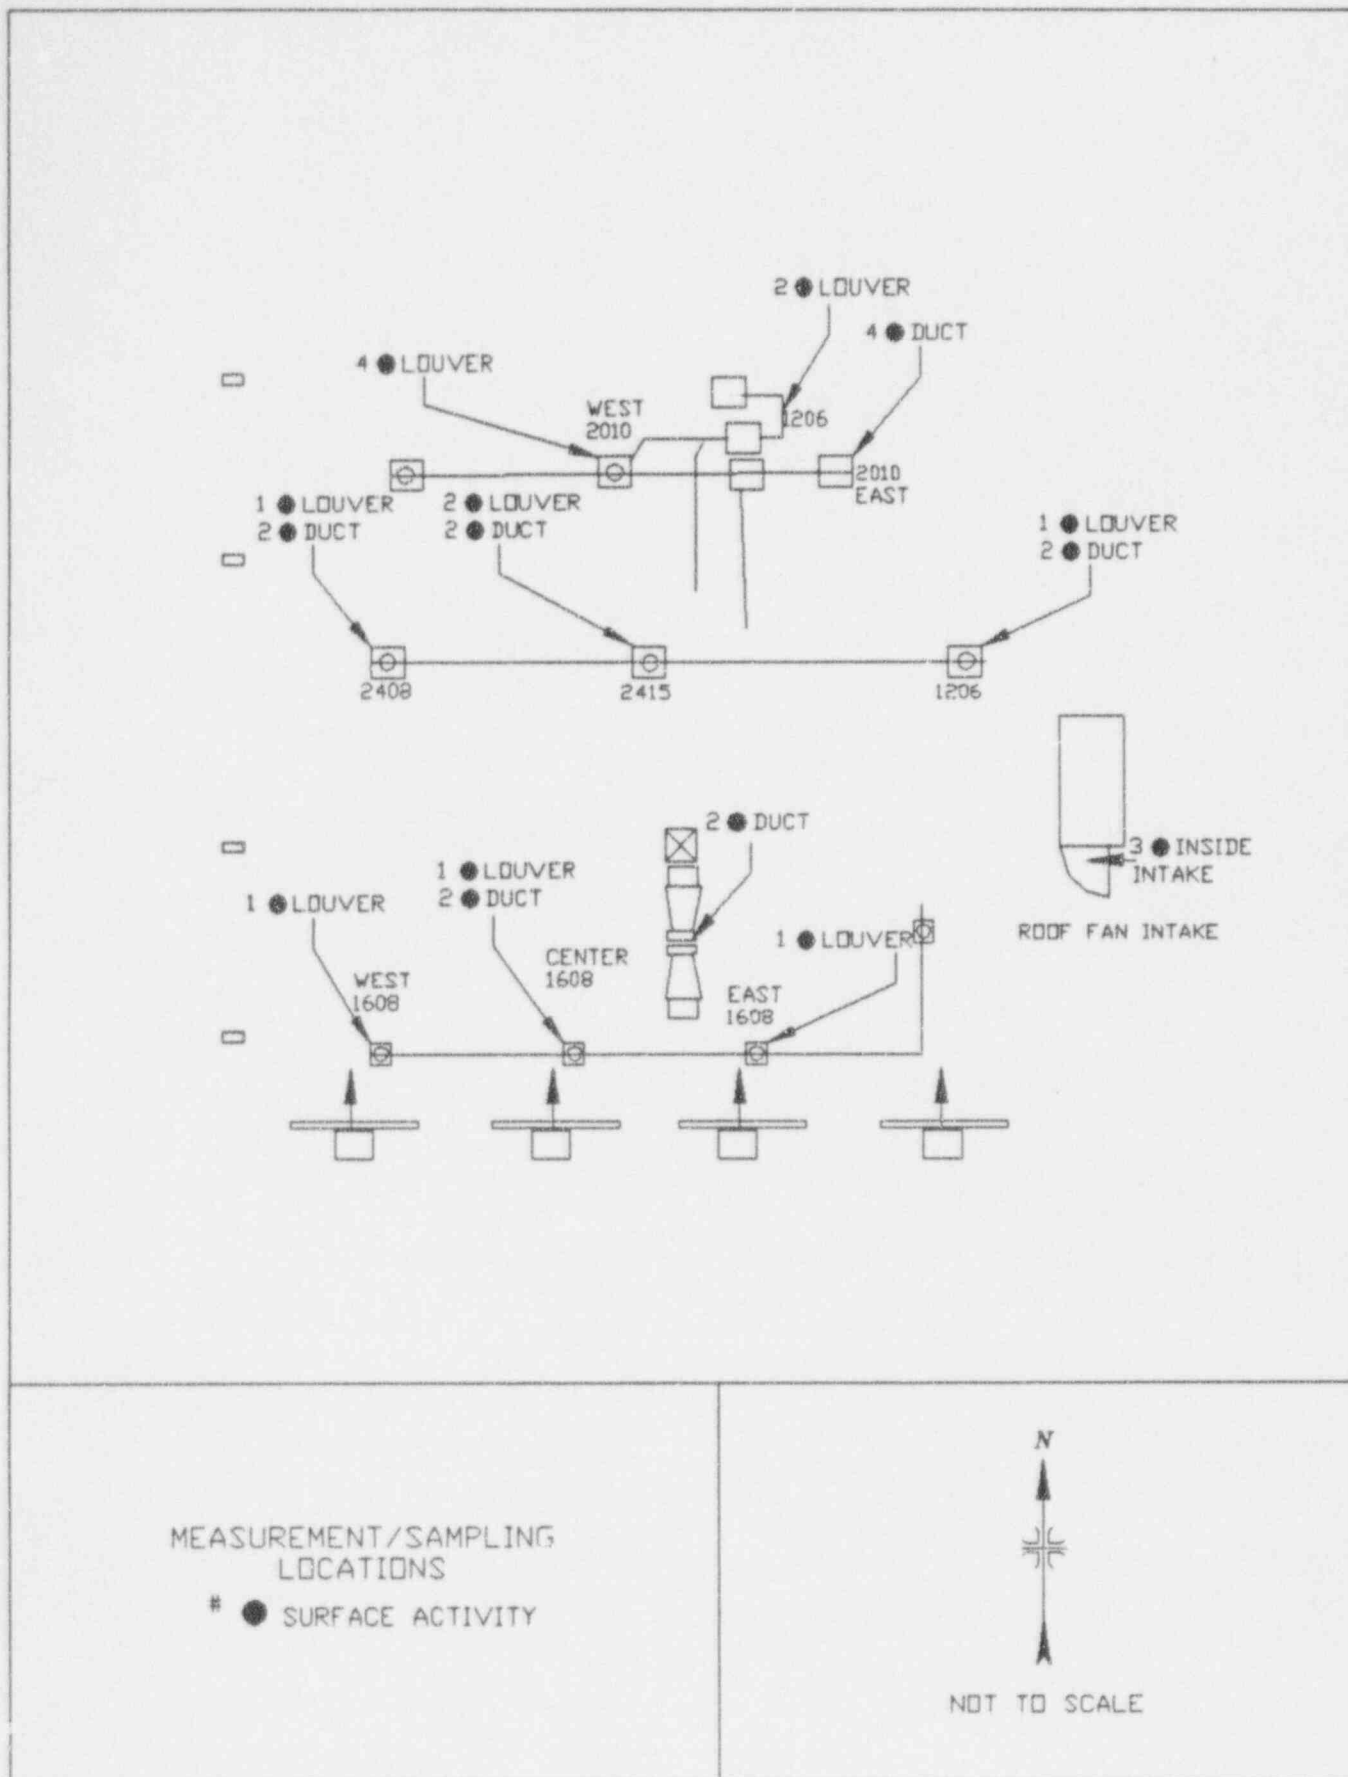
Secondary Access Facility, Ventilation System (SU071) - Measurement and Sampling Locations
